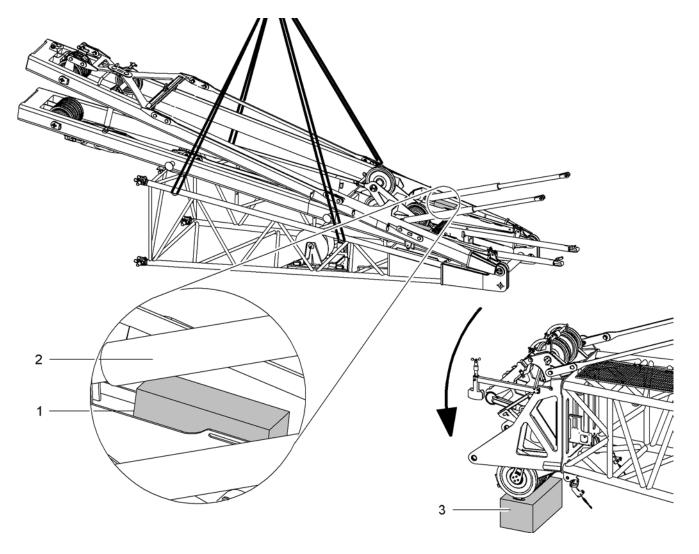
Chocking with wooden blocks and lifting the jib base section to the boom head section
